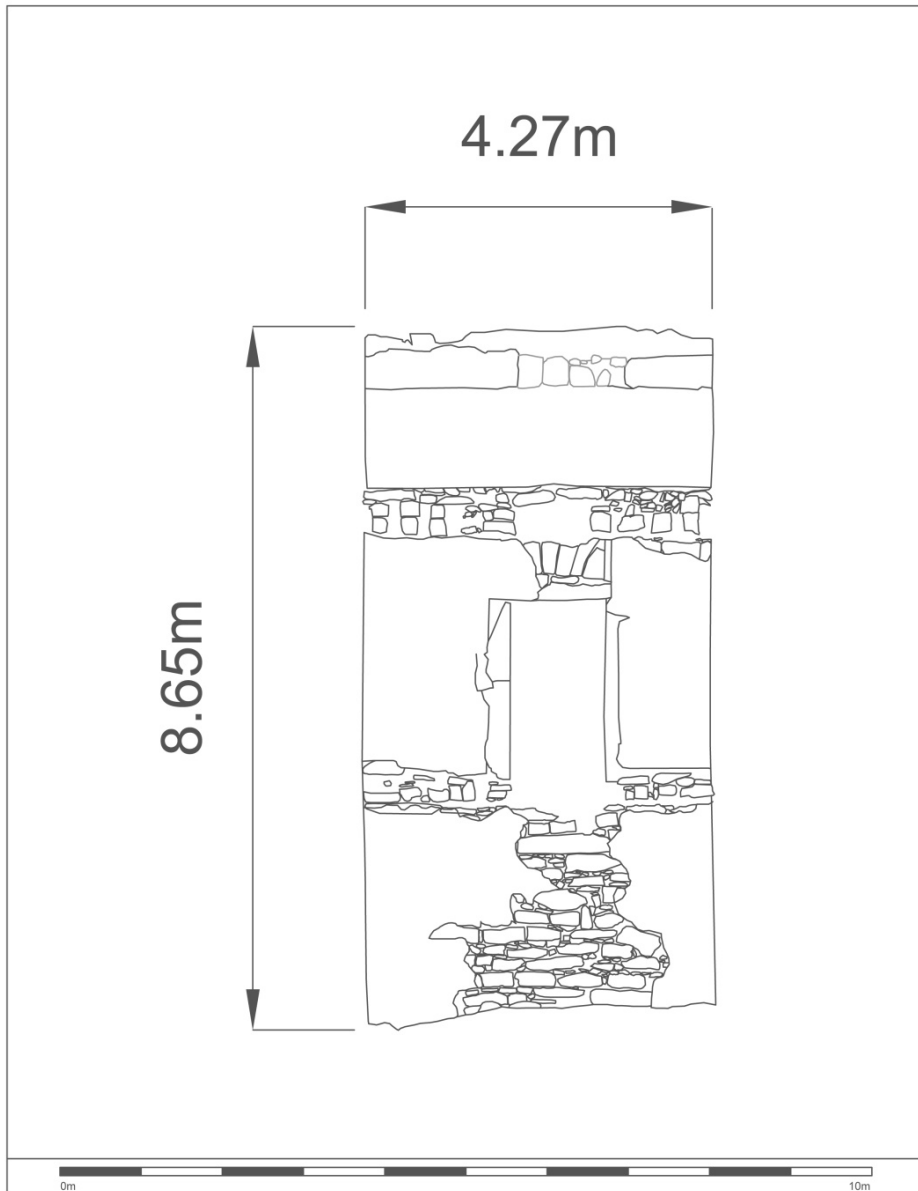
Internal elevation of the south-west wall of the signal tower at Inishmore Signal Station.
